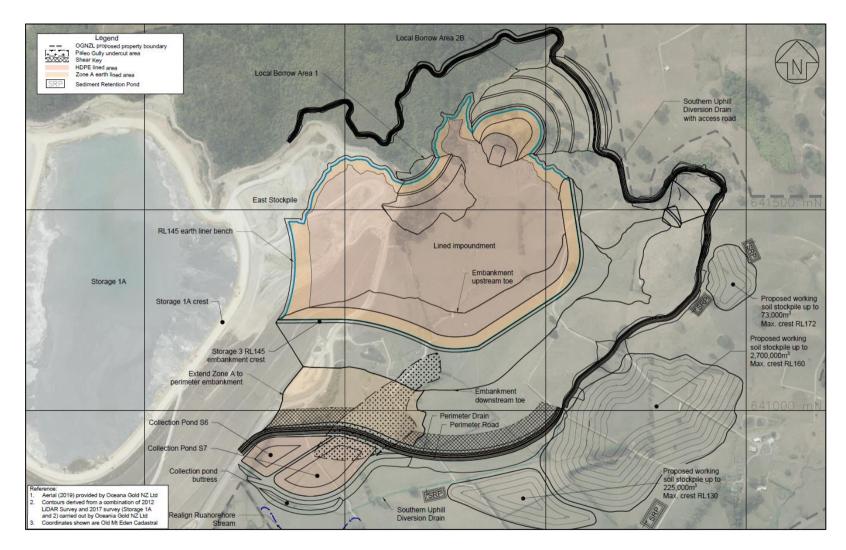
Concept Plan of TSF3 Interim Embankment to 145 m RL (EGL (2025c)
